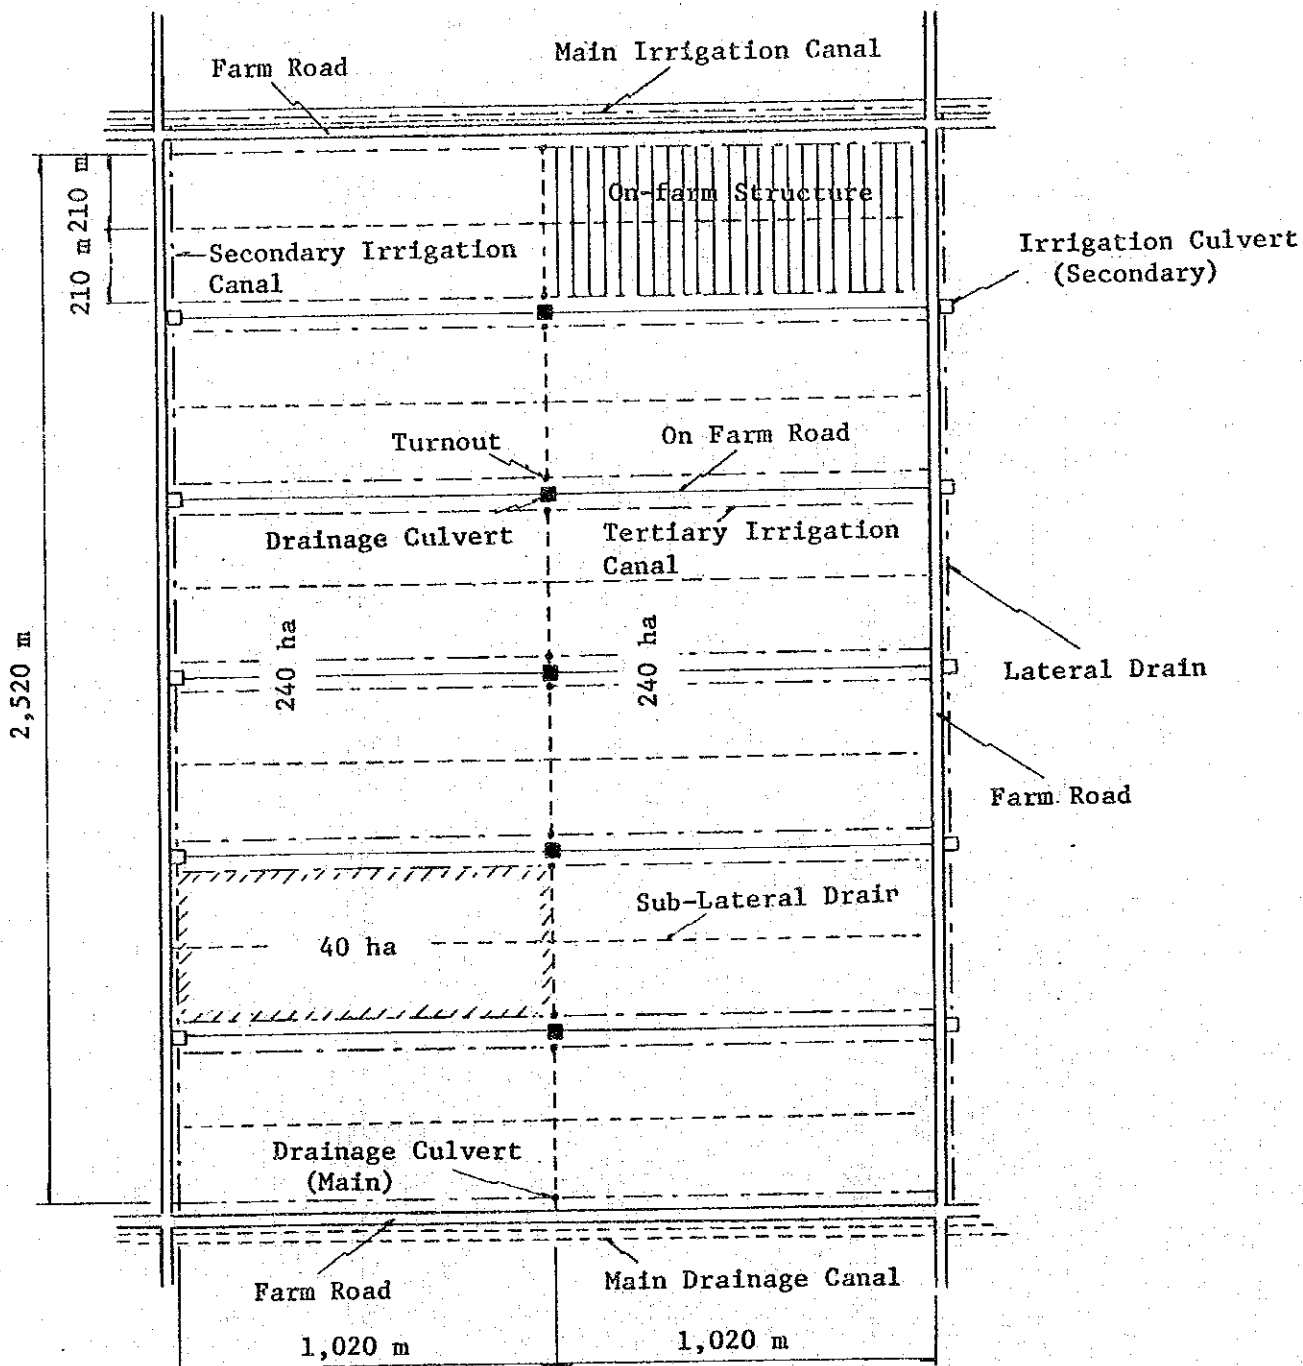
TYPICAL LAYOUT OF ON-FARM STRUCTURE
